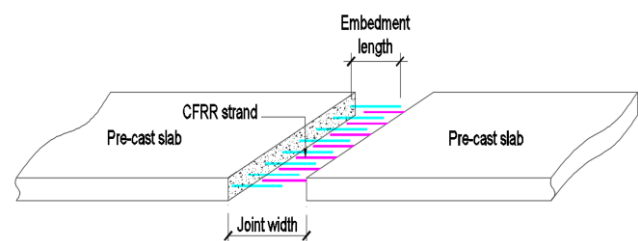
The in-situ joint of pre-cast slabs reinforced by CFRP strand
